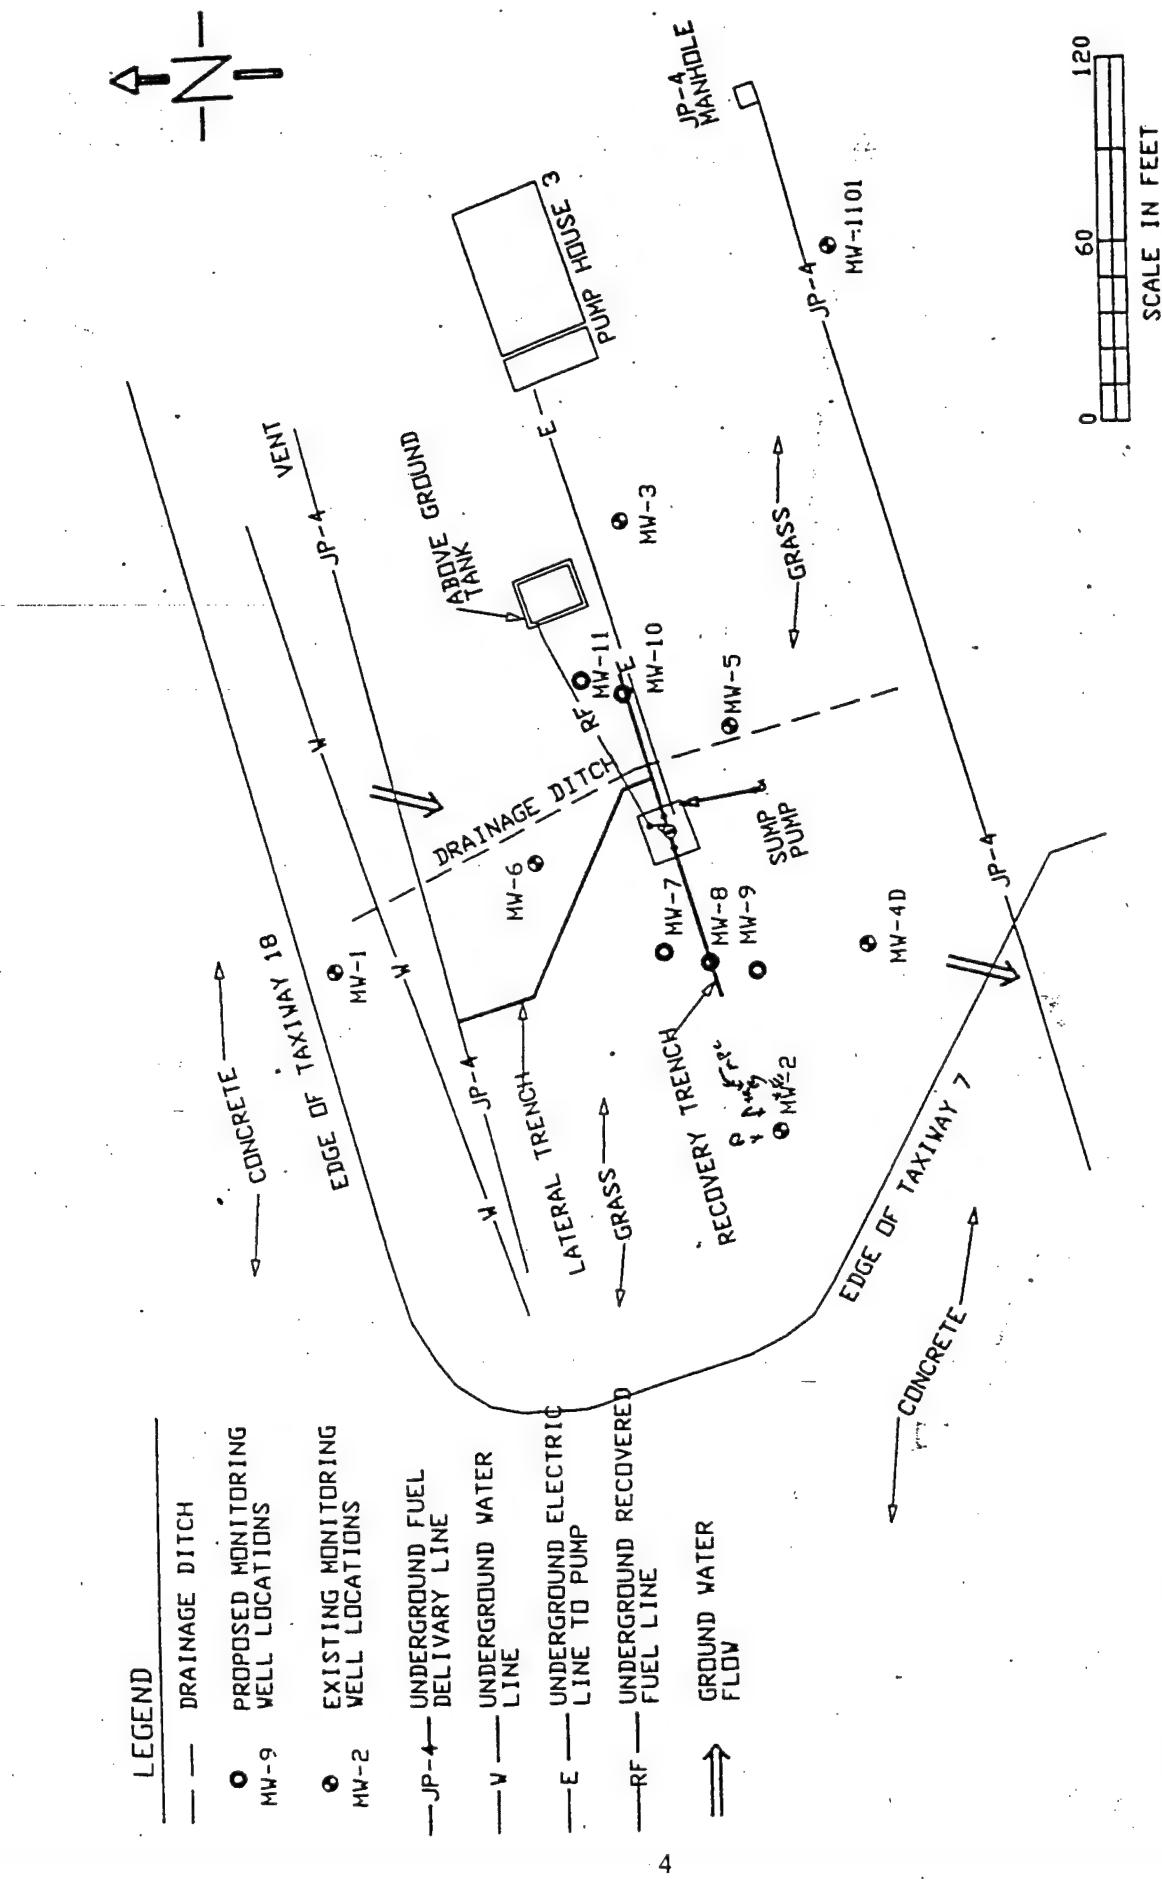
Locations of Existing and Proposed Monitoring Wells at Site SS-12.
